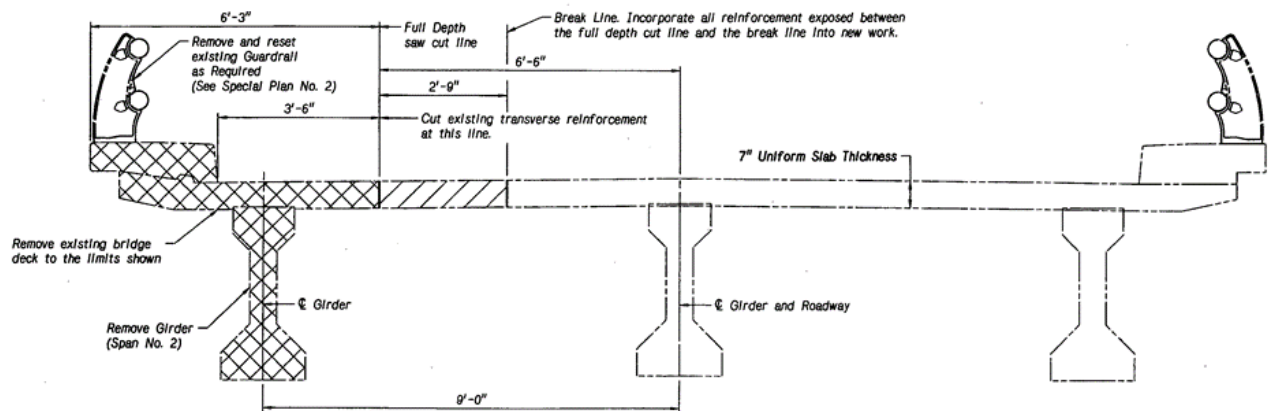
Girder replacement procedure, cross-section to be removed, from the replacement documents of York East Bridge, courtesy of NDOT
